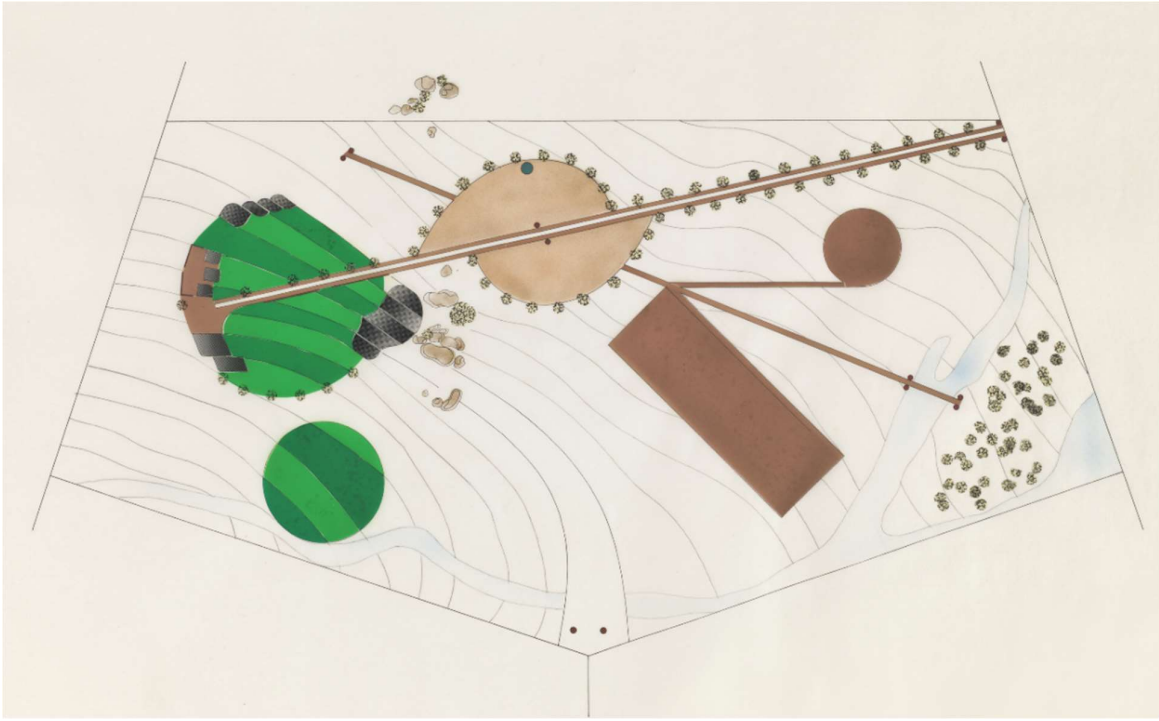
12 Site Plan. Drawing: Stanley Saitowitz. (See Image credits)
